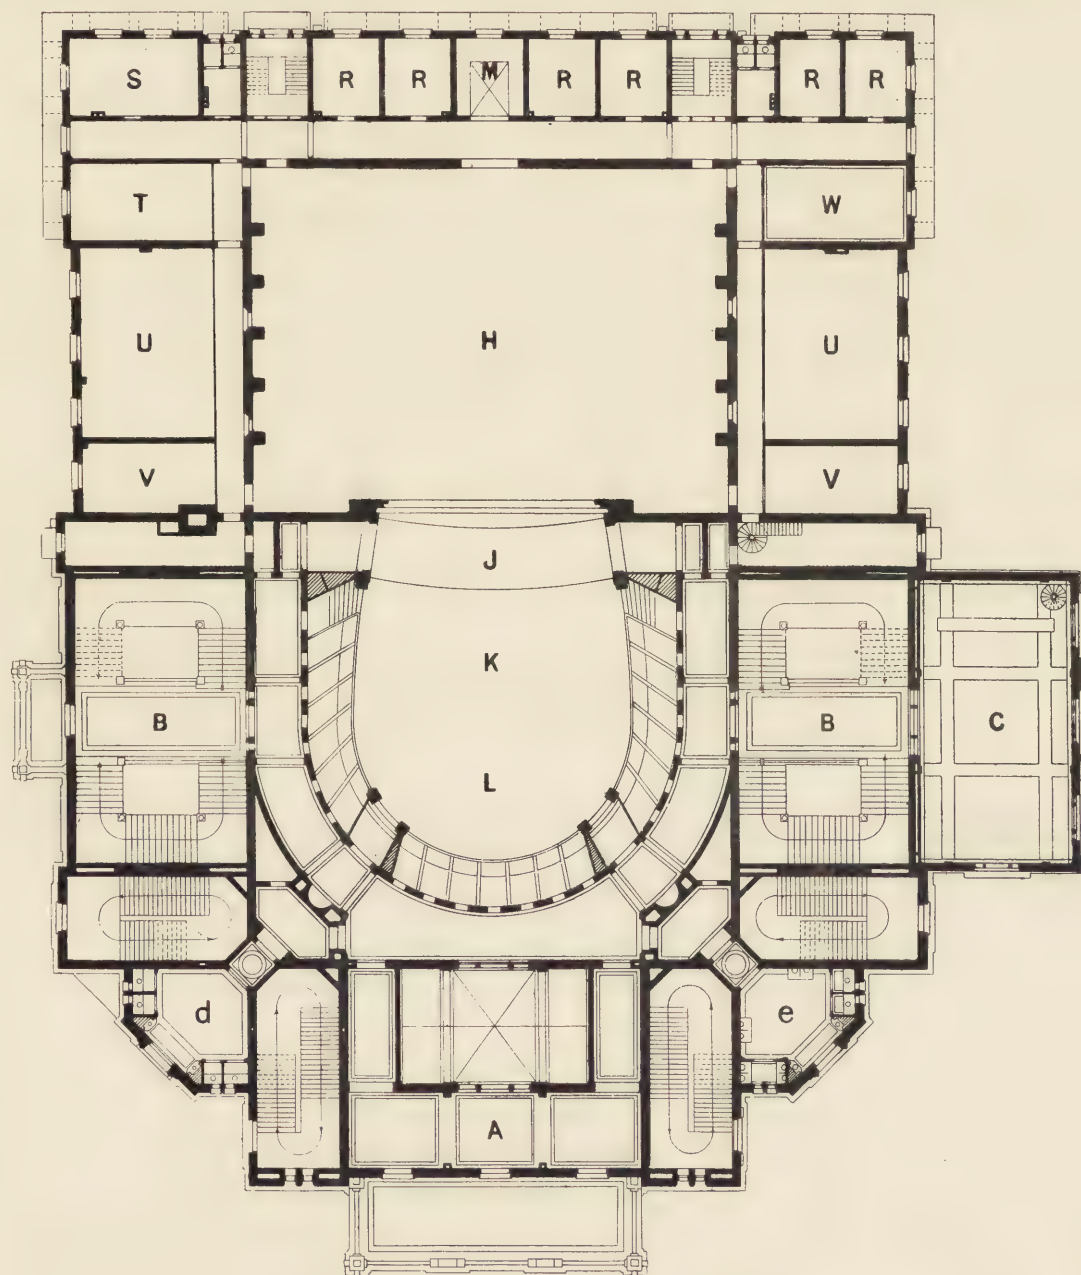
FIRST MEZZANINE FLOOR: STALLS.
